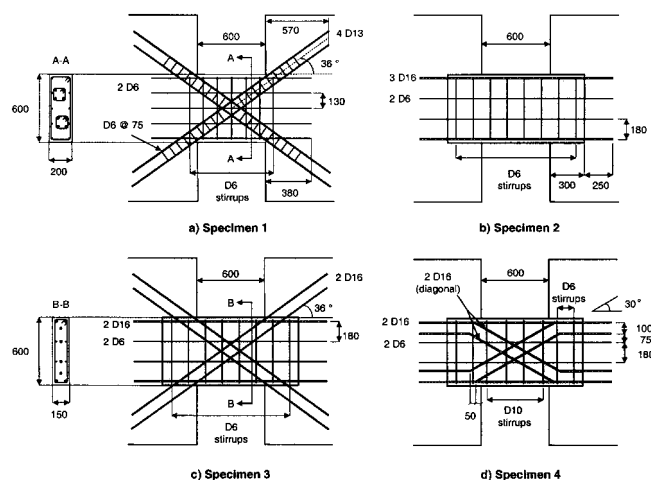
Reinforcement details of test specimens (dimensions in mm. Concrete cover = 40 and 35 mm for reinforced concrete and high-performance fiber-reinforced cement composite specimens, respectively).
